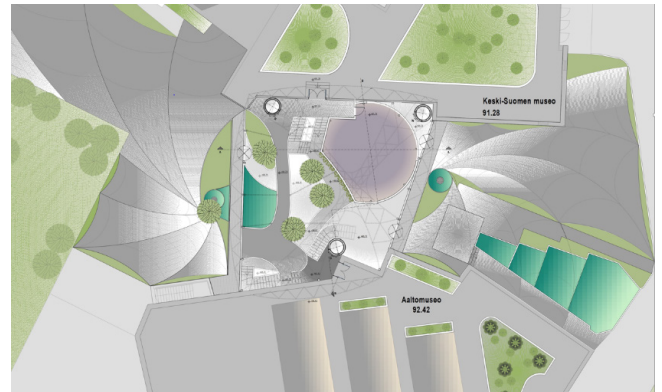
Third floor plan; (on a level + 91.28 / + 92.42)
